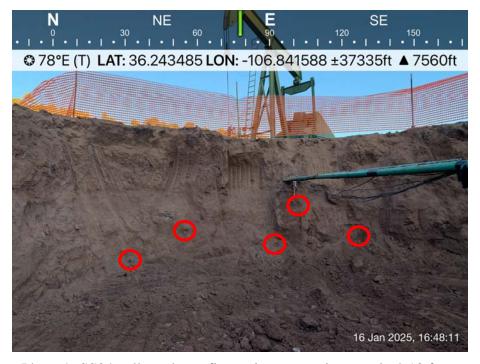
SS04 collected as a five-point composite sample 4-10 ft bgs from east sidewall of excavation.
